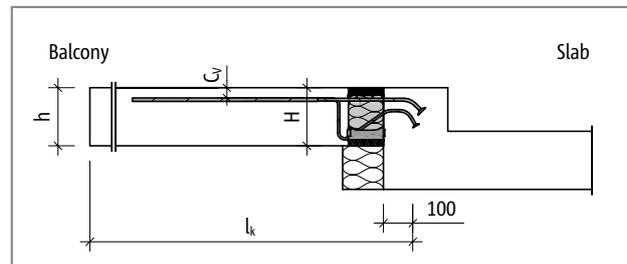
Schöck Isokorb® XT type K-O: Static system
